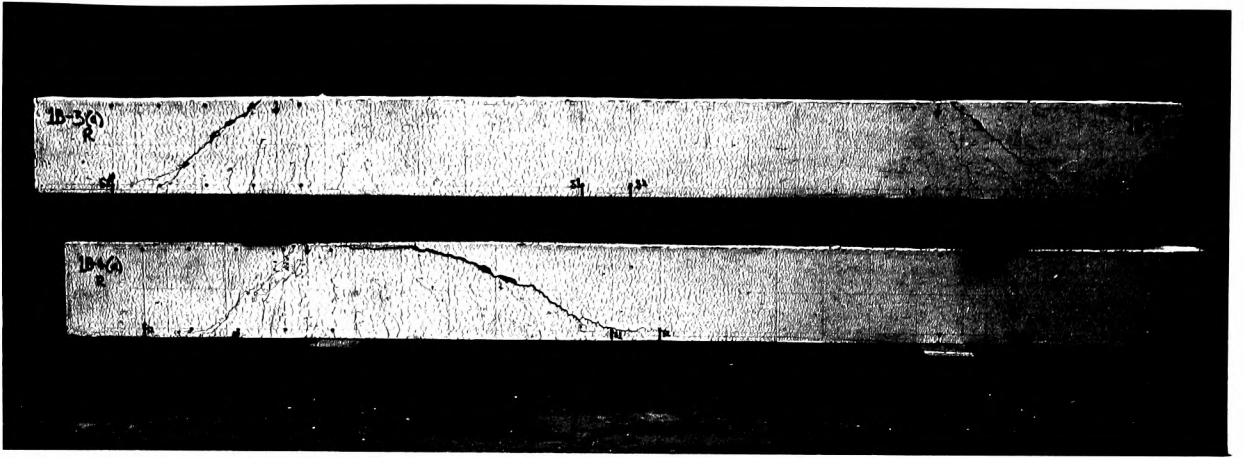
Beams 1B-3(R) and 1B-4(R)
